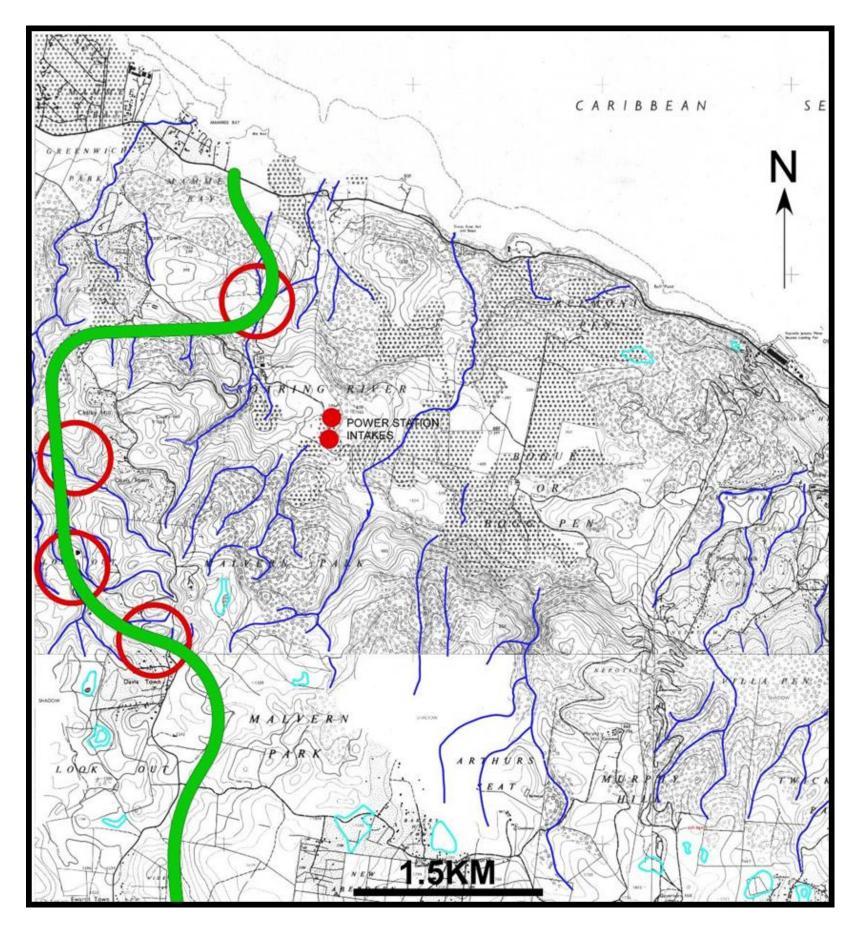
Proposed route of the north-south highway down the north slope of the island, (section 2).
